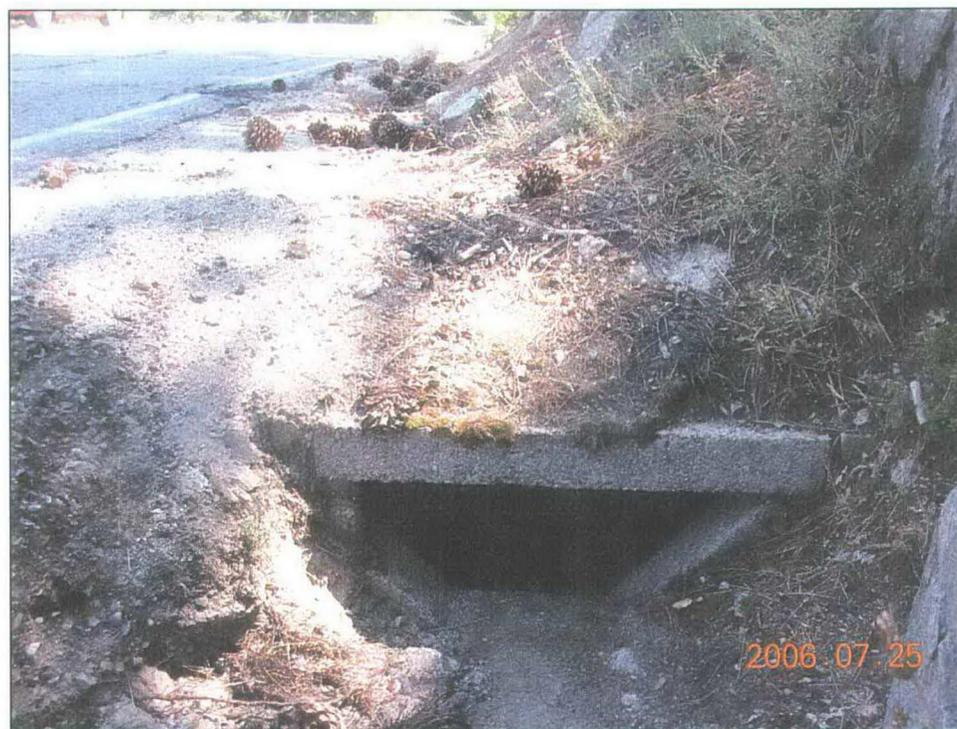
Example of Concrete Slab Drop Inlet (at Mile 10.69)
